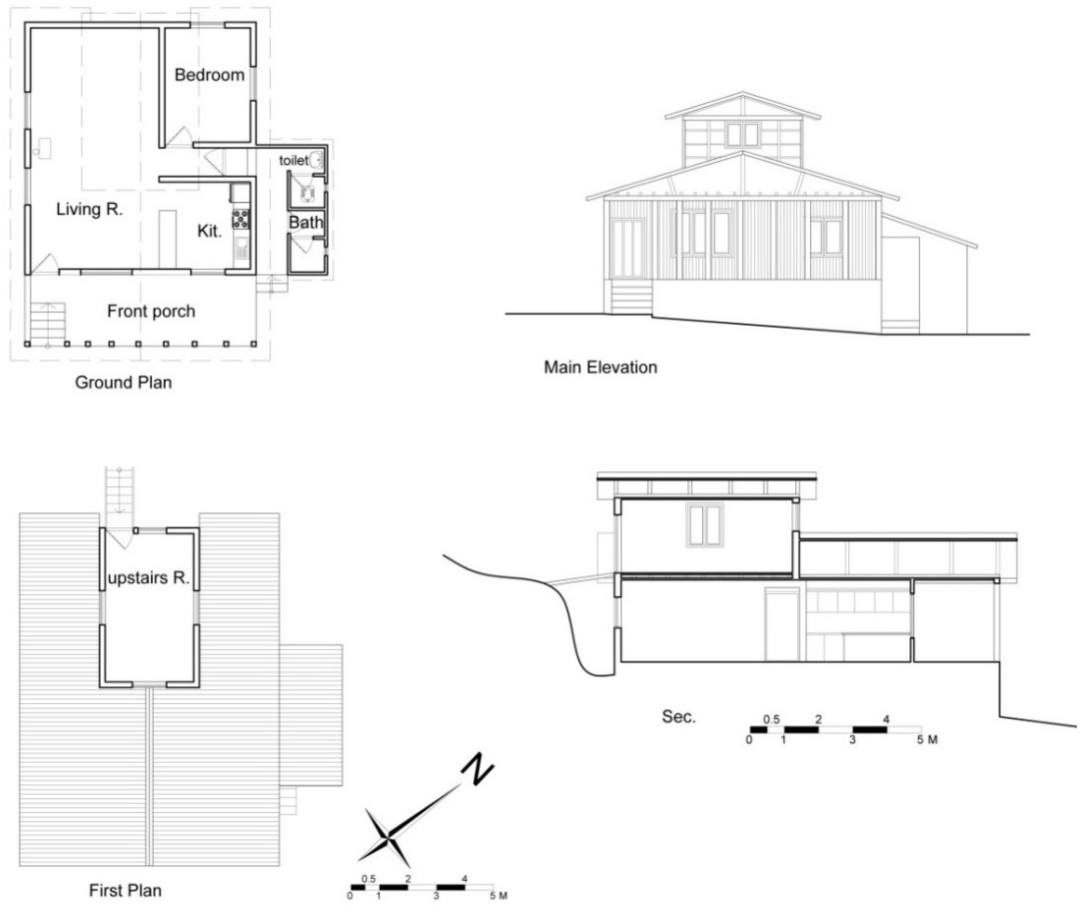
New style house (sample no.17 in Diva)_ one story, timber frame house
